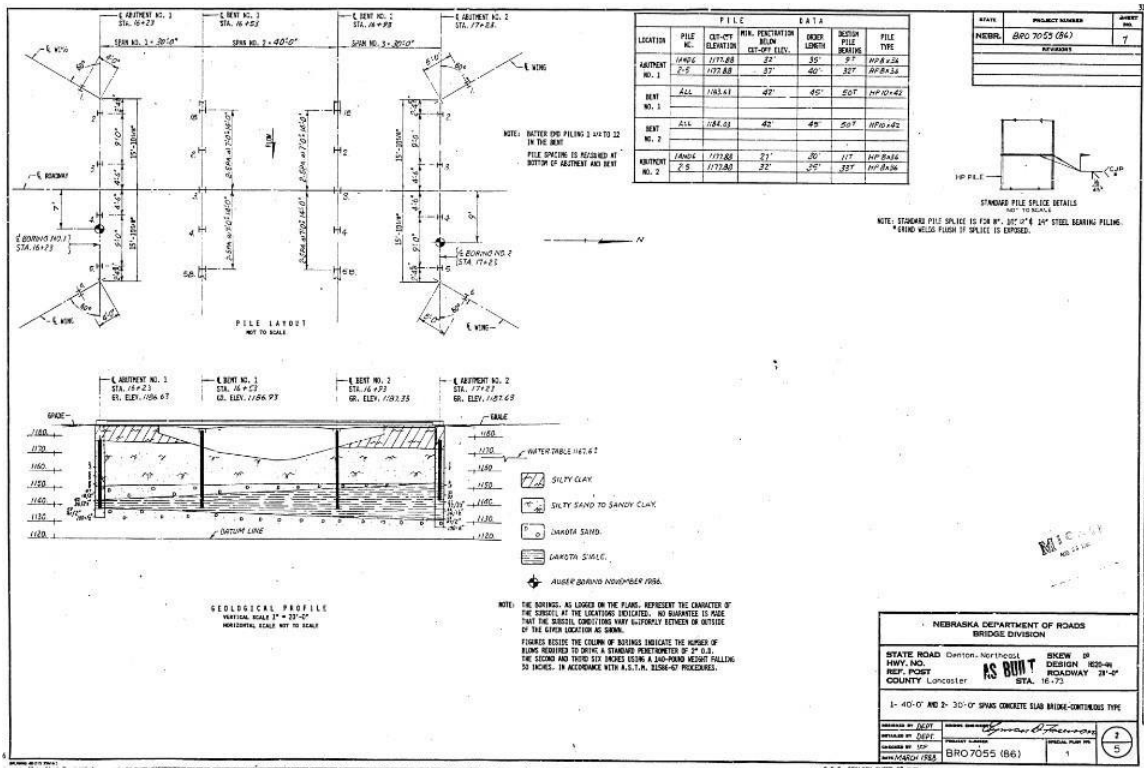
Lincoln Bridge Plan (courtesy of NDOT).
